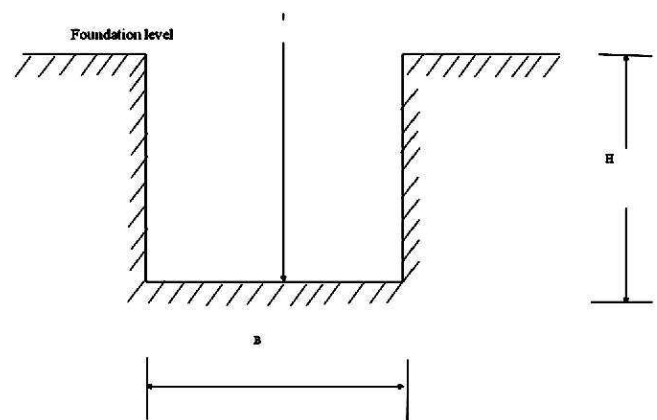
Typical foundation excavation for soil sampling (B - foundation width, H - foundation height. Drawing, not to scale)
